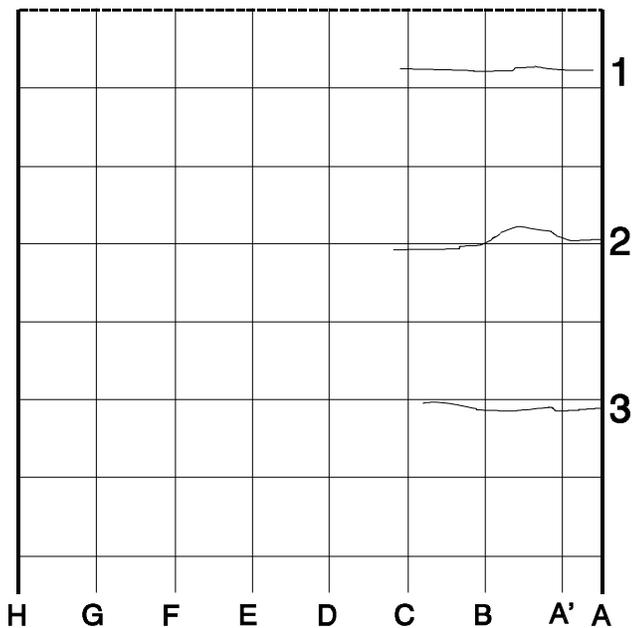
POJ-PU-74-TH cracking patterns on north face of pier at dead load
